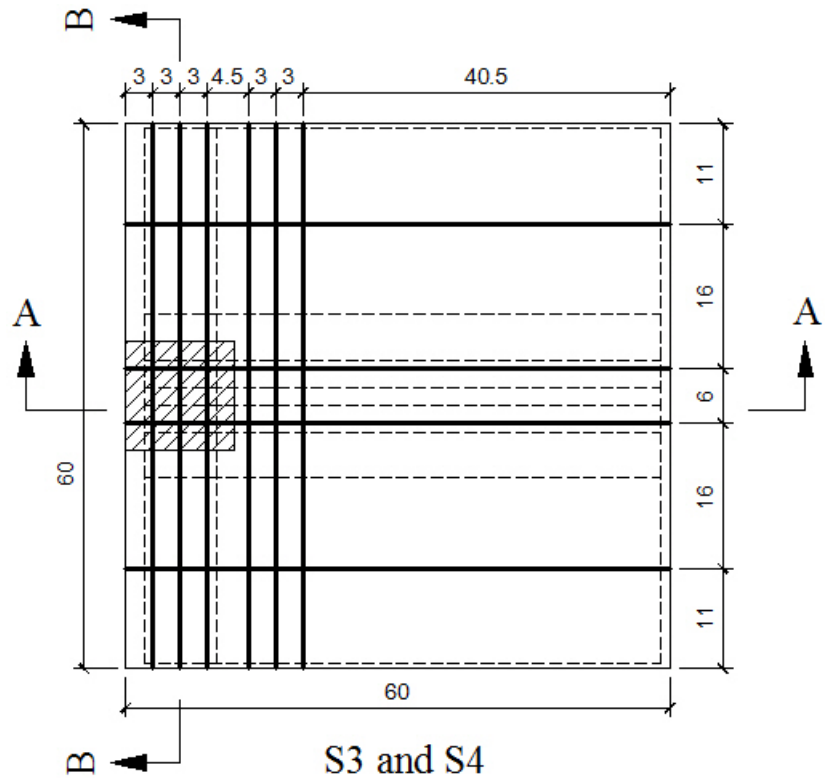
Details of reinforcement and dimension of Specimens S3 and S4
